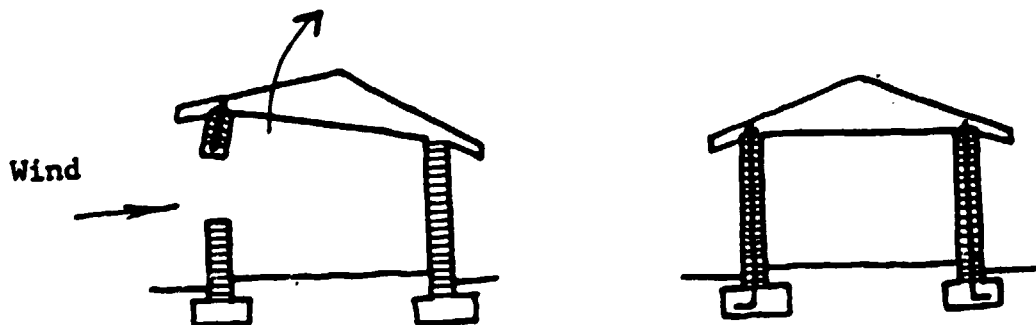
Uplift forces must be carried from the top to the base of the walls
